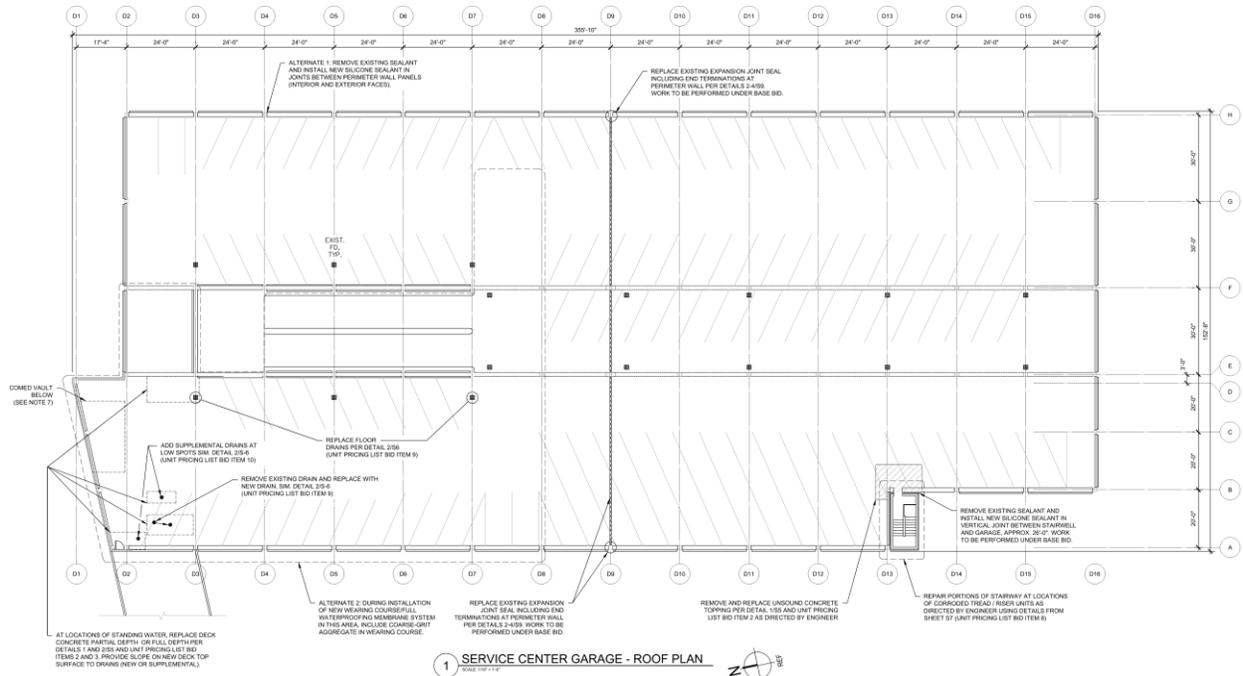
Service Center Building D Garage roof plan reproduced from the 2018 repair project drawings.
